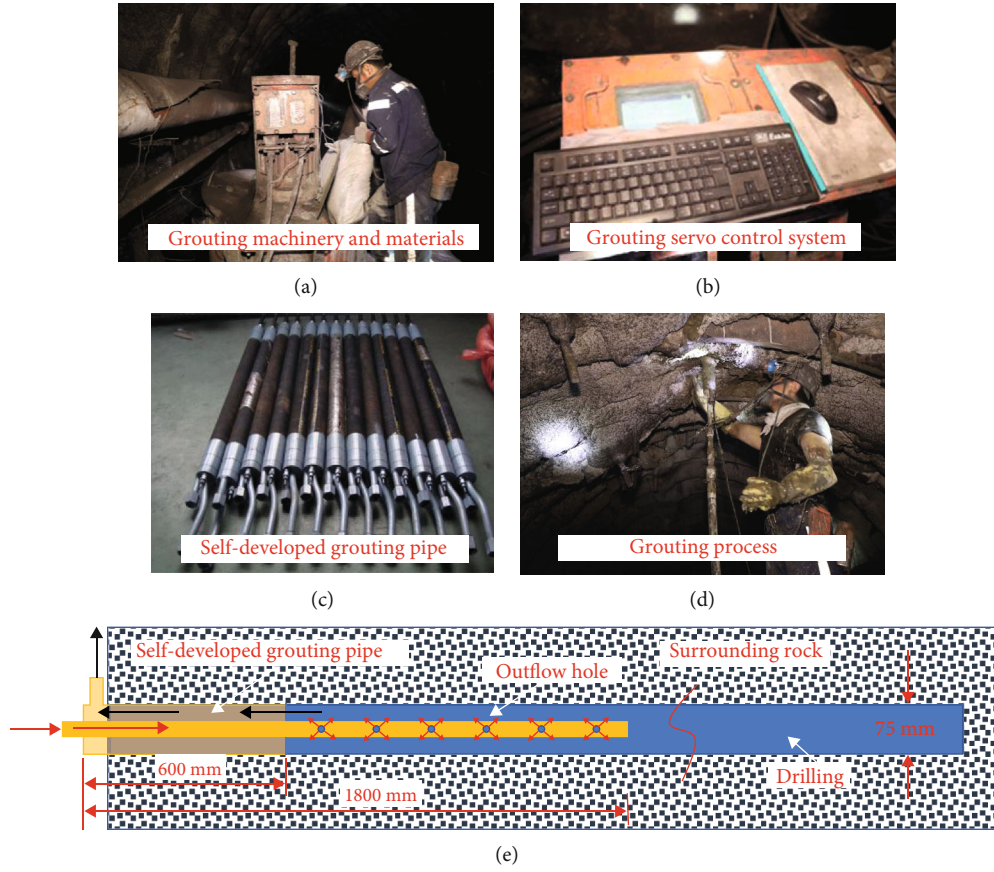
On-site grouting process and a newly developed grouting pipe installation method.
